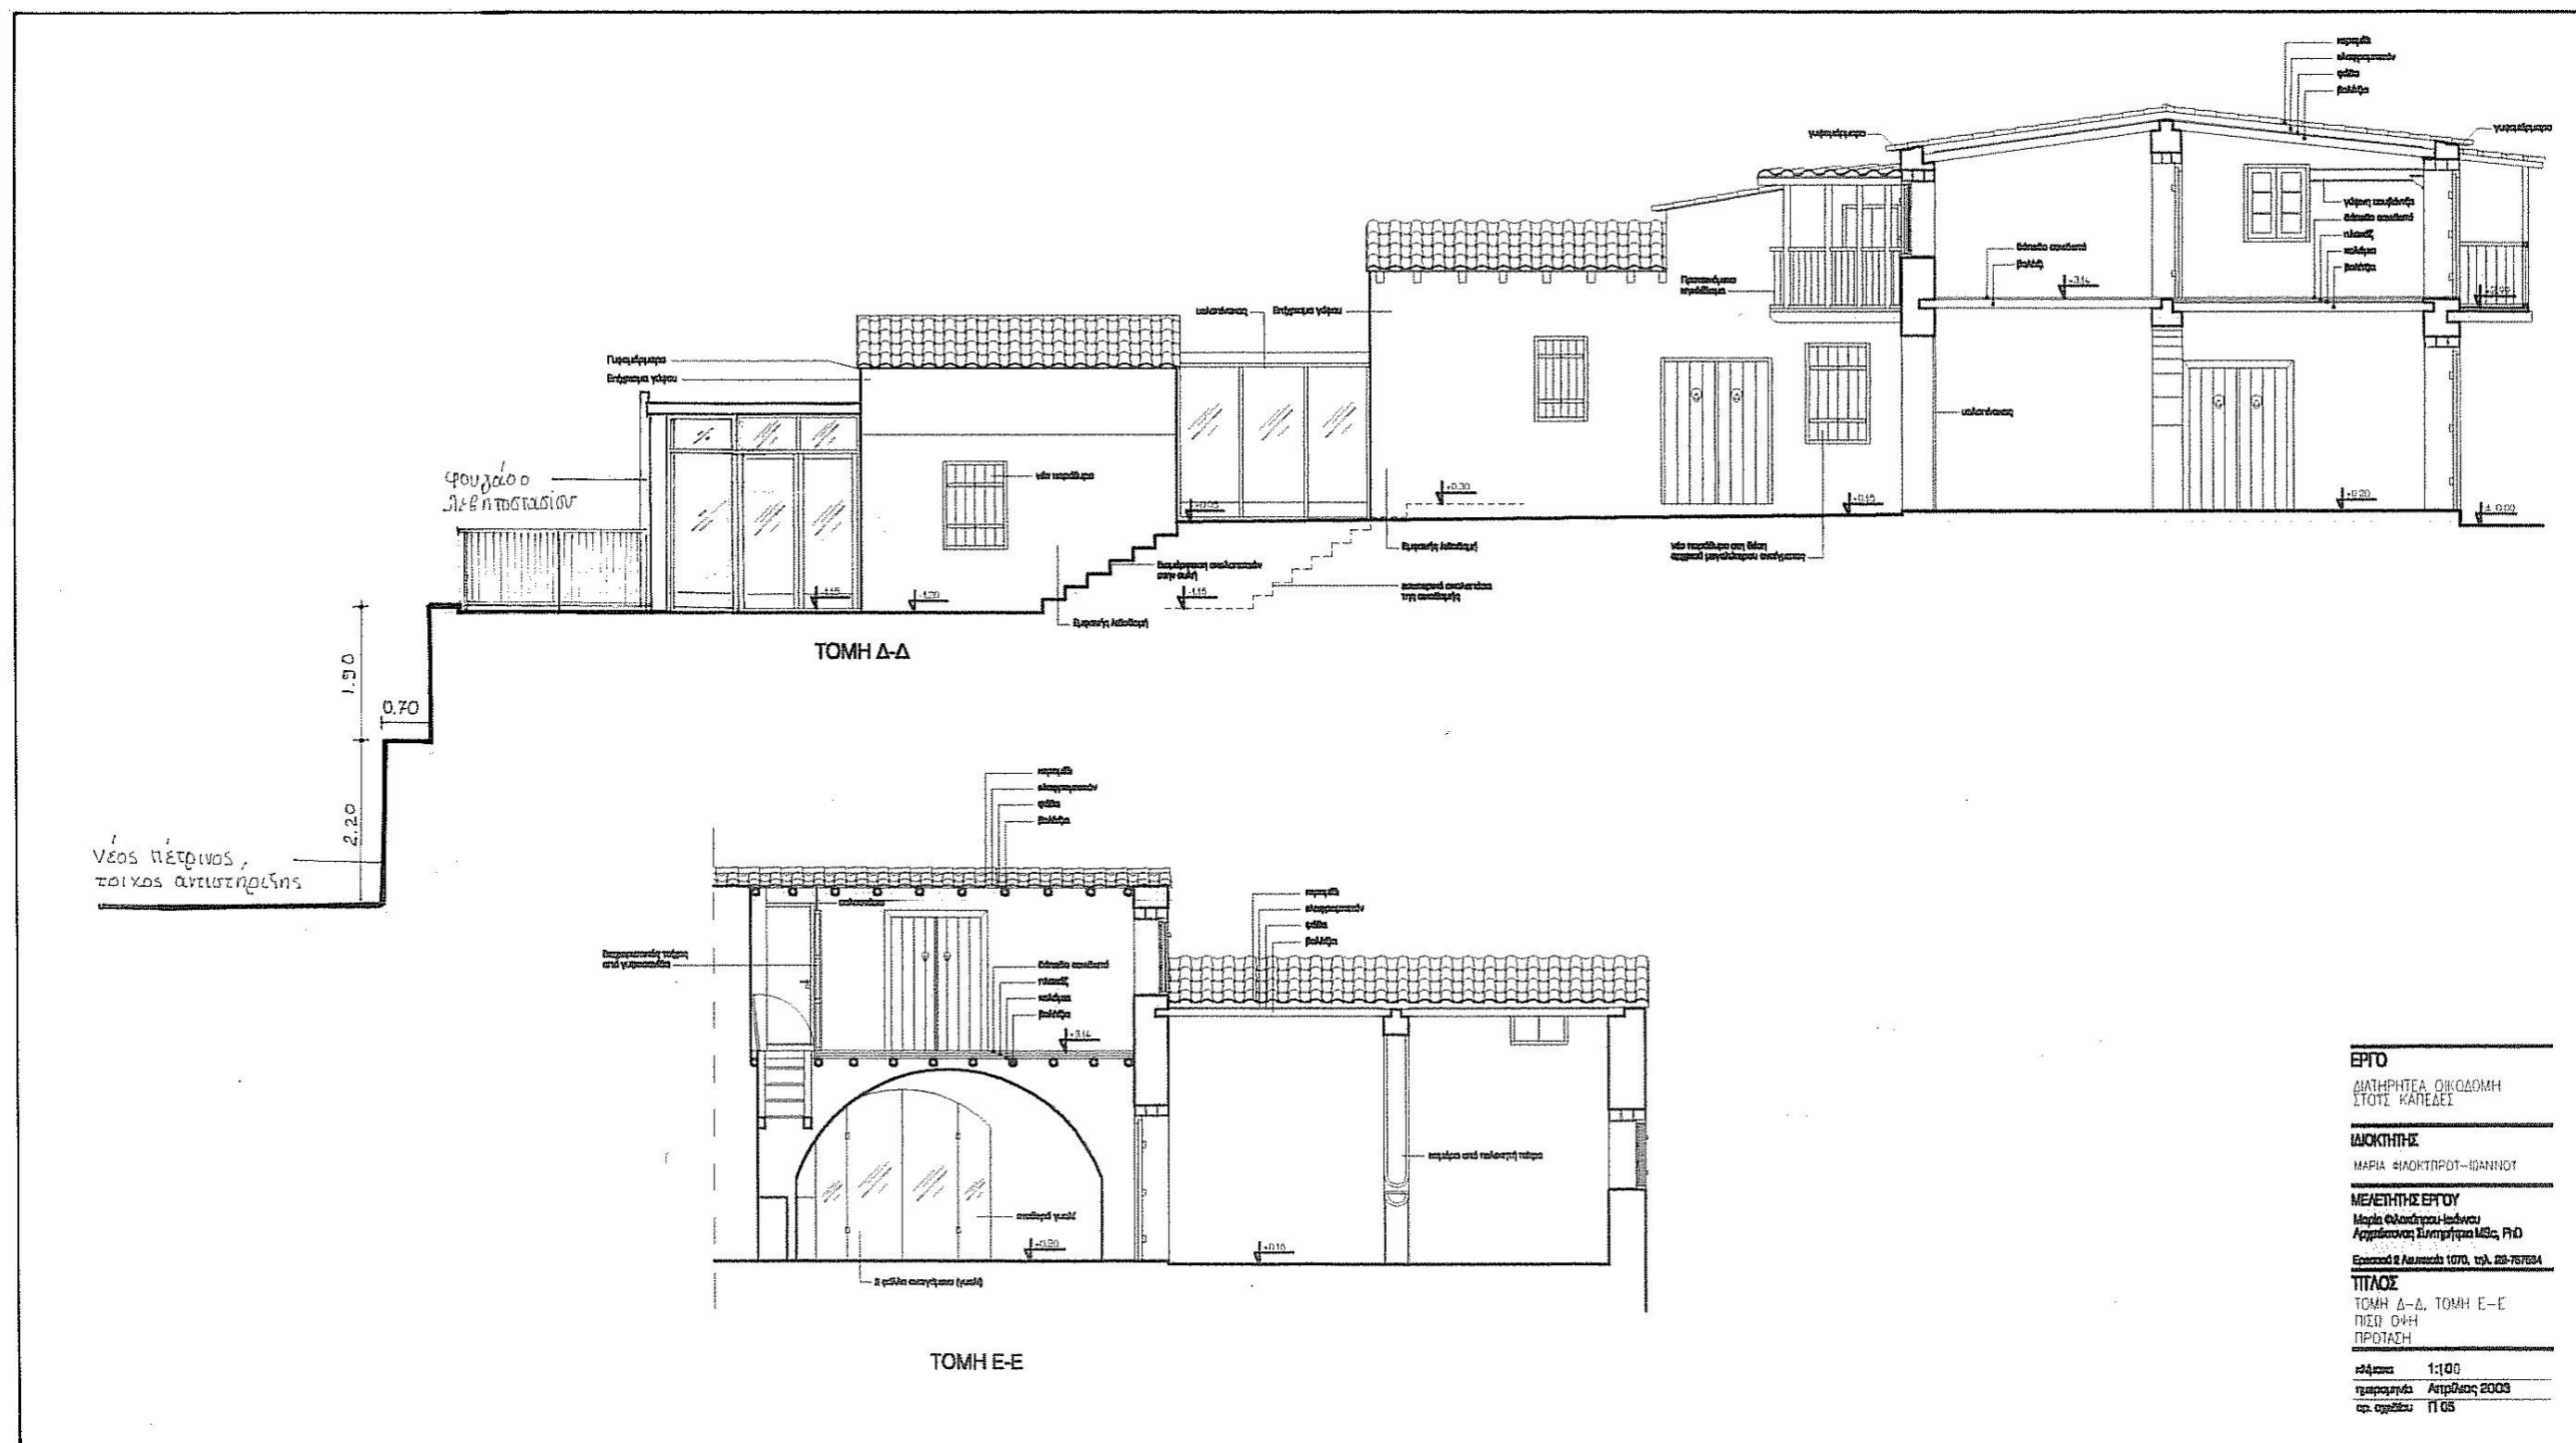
Main elevation and sections of the vernacular dwelling – Proposal for the restoration and reuse. © M. Philokyprou
